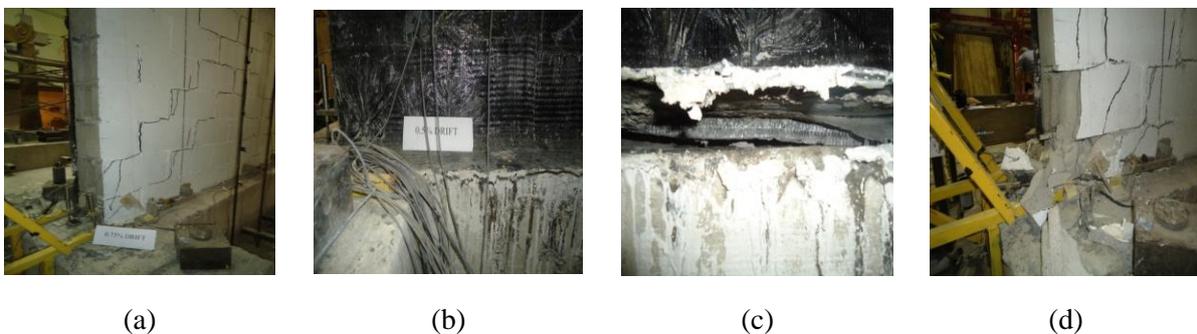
(a) Initial diagonal crack, (b) FRP sheet connected to the foundation prior to the anchor pull-out cone failure, (c) FRP anchorage failure and the separation of FRP from the foundation, (d) corner crushing of masonry
